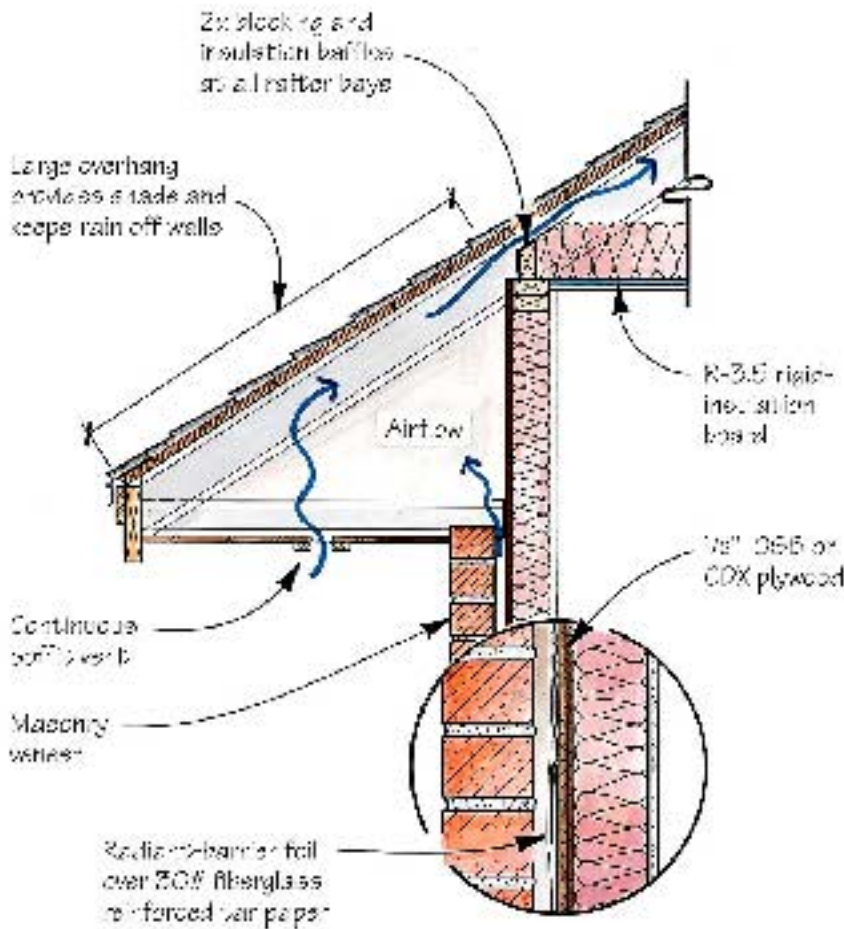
For exterior sheathing, the author prefers to use plywood or OSB rather than rigid foam. A carefully lapped and tightly sealed layer of 30-pound building paper over the sheathing creates a drainage plane that directs water down and away from the wall. In addition, all cracks and wall penetrations are sealed on both sides using expanding foam and caulk.
